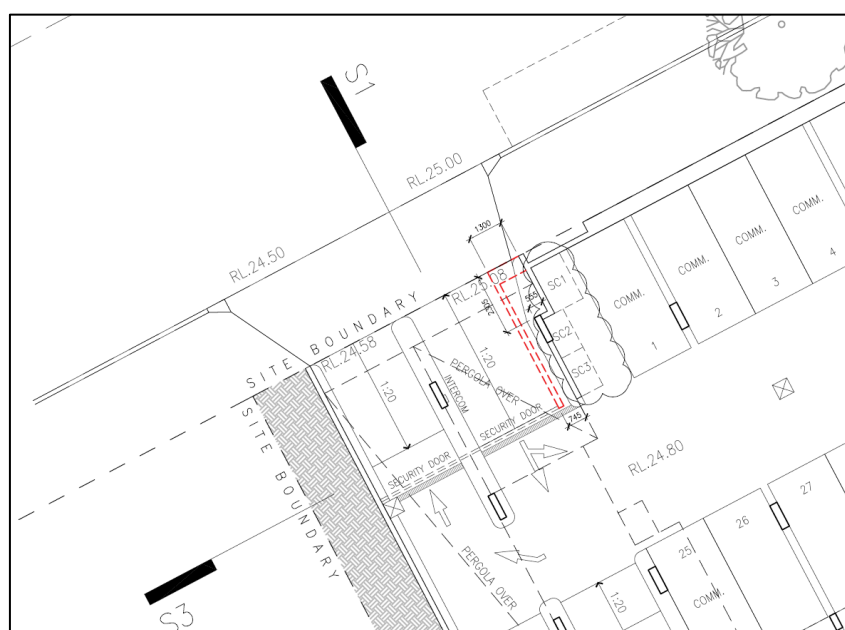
Extract of the proposed basement plan indicating the location security door and intercom to gain access to the basement car park.
